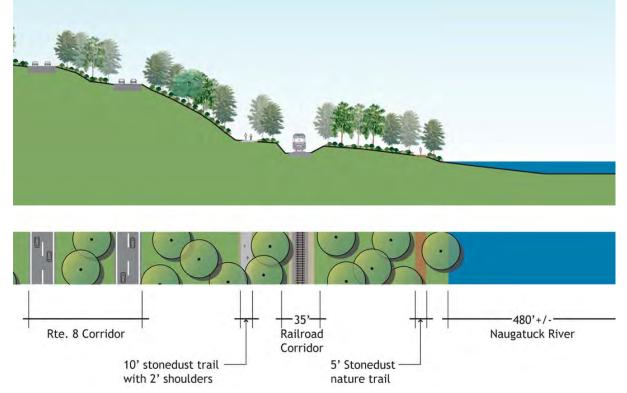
Trail cross-section north of Frost Bridge Road (Route 262) showing the greenway trail's relationship to the Naugatuck River, the Naugatuck Railroad and Route 8.
